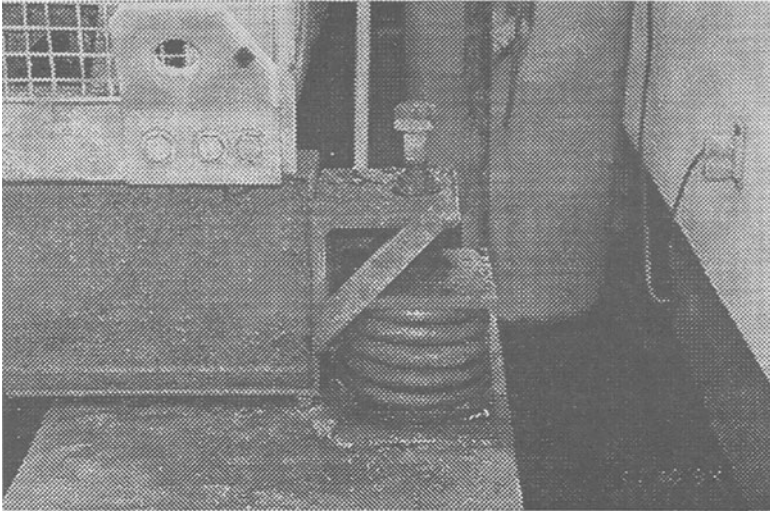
Mechanical equipment damage at the roof of BURBANK 6 building.
